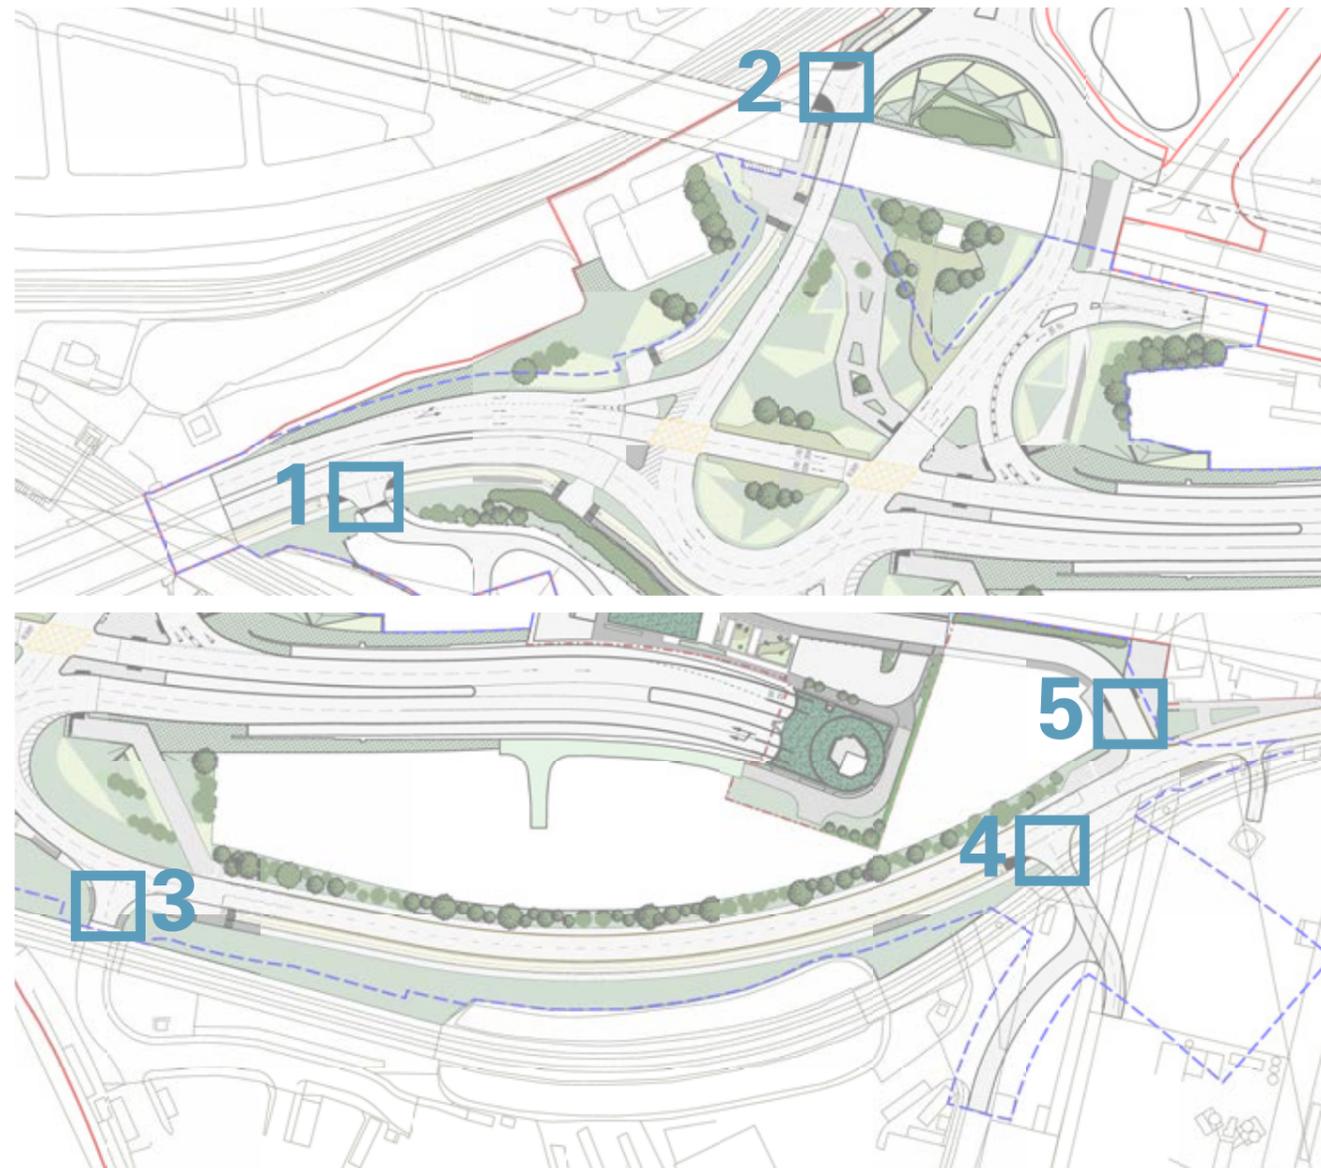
Key junctions at Silvertown - Northern Section to TBR (Junctions 1&2) and Southern Section to Dock Road (Junctions 3-5)
